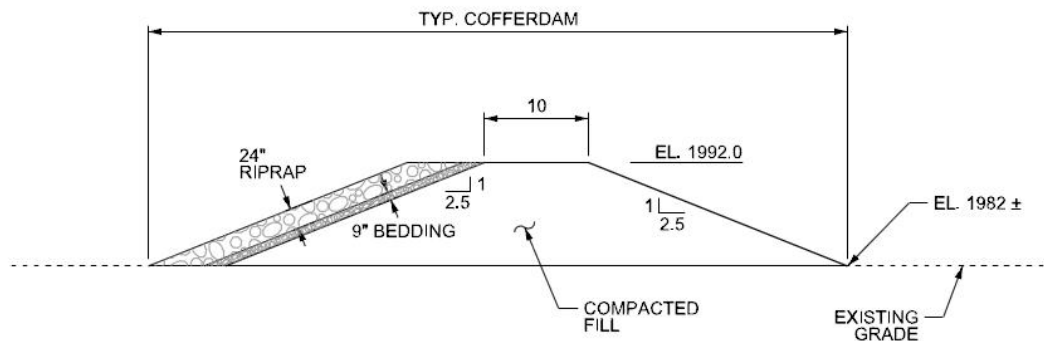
Typical Earthen Cofferdam with Riprap Revetment
